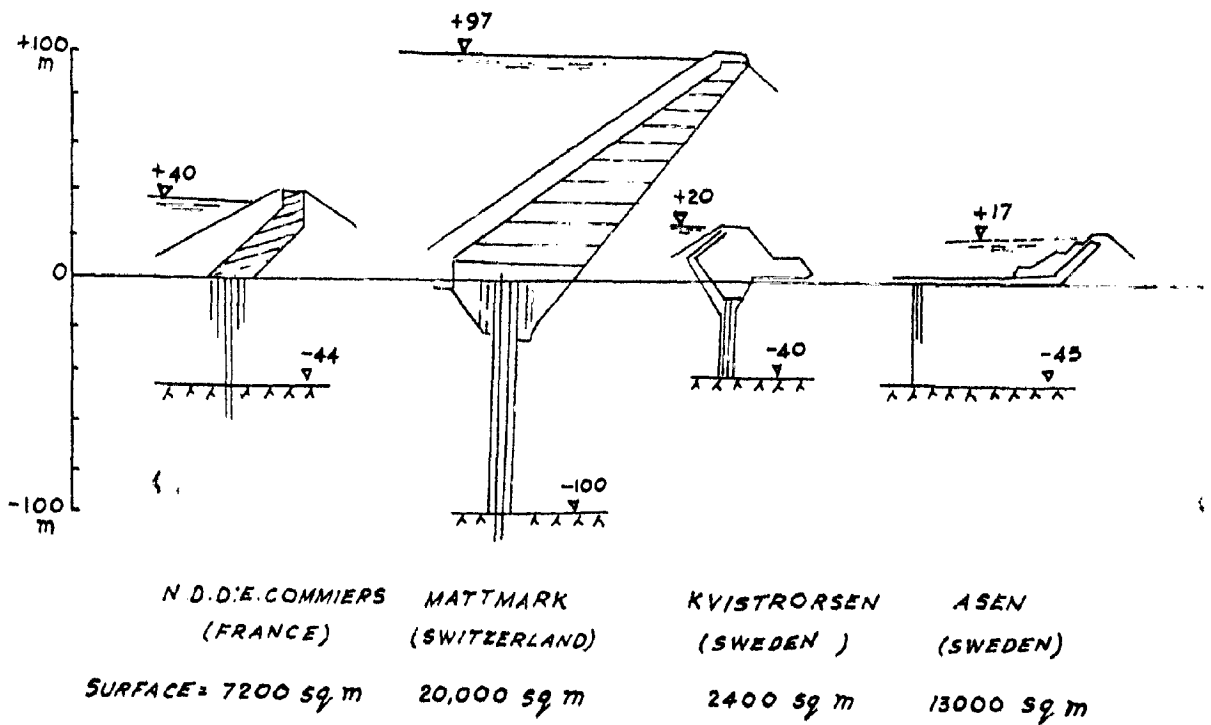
SHOWING GROUT CURTAIN IN ALLUVIAL SOIL FOR DAM FOUNDATIONS.
